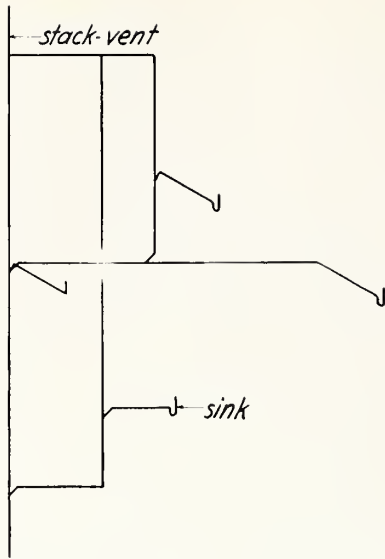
Piping lay-out for two-story house with one bathroom.
